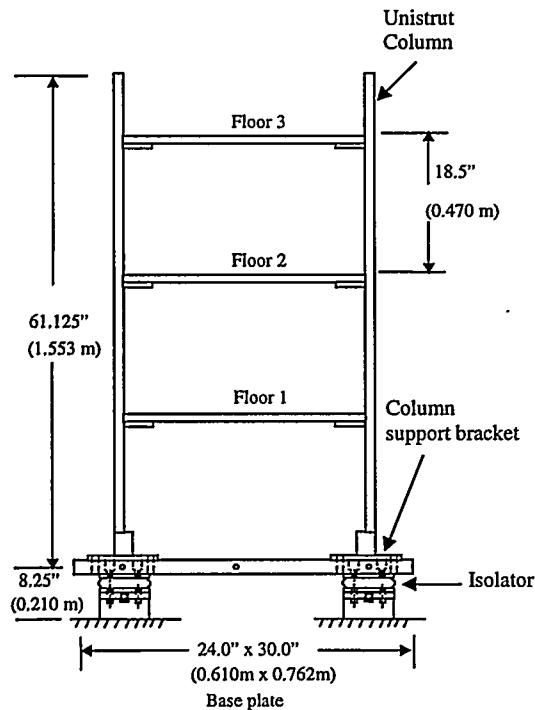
Assembled frame structure, out of plane shaking (not to scale).
